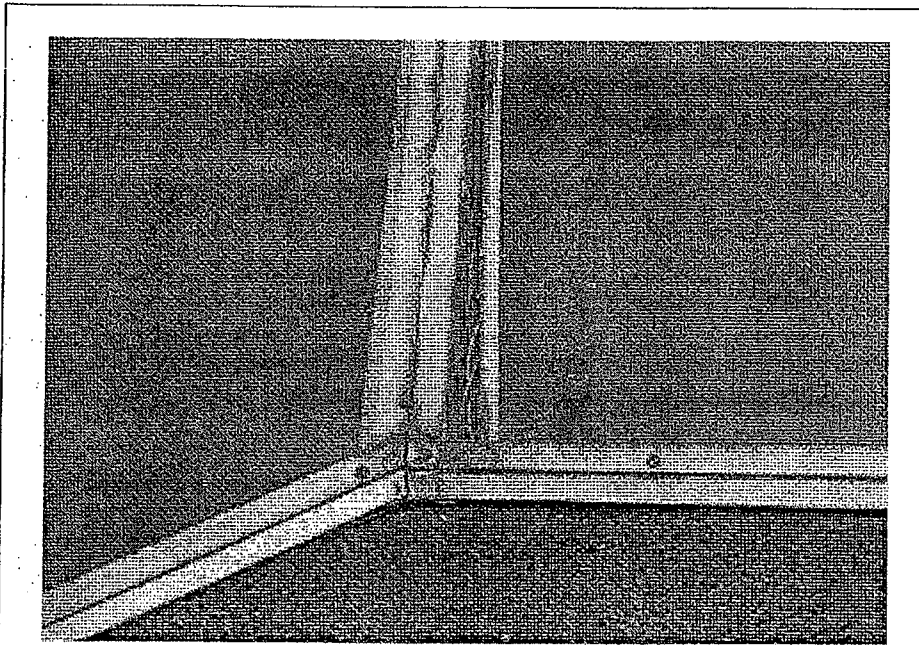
Windows and Louvres – Displaced trims on curtain wall stairs windows.
